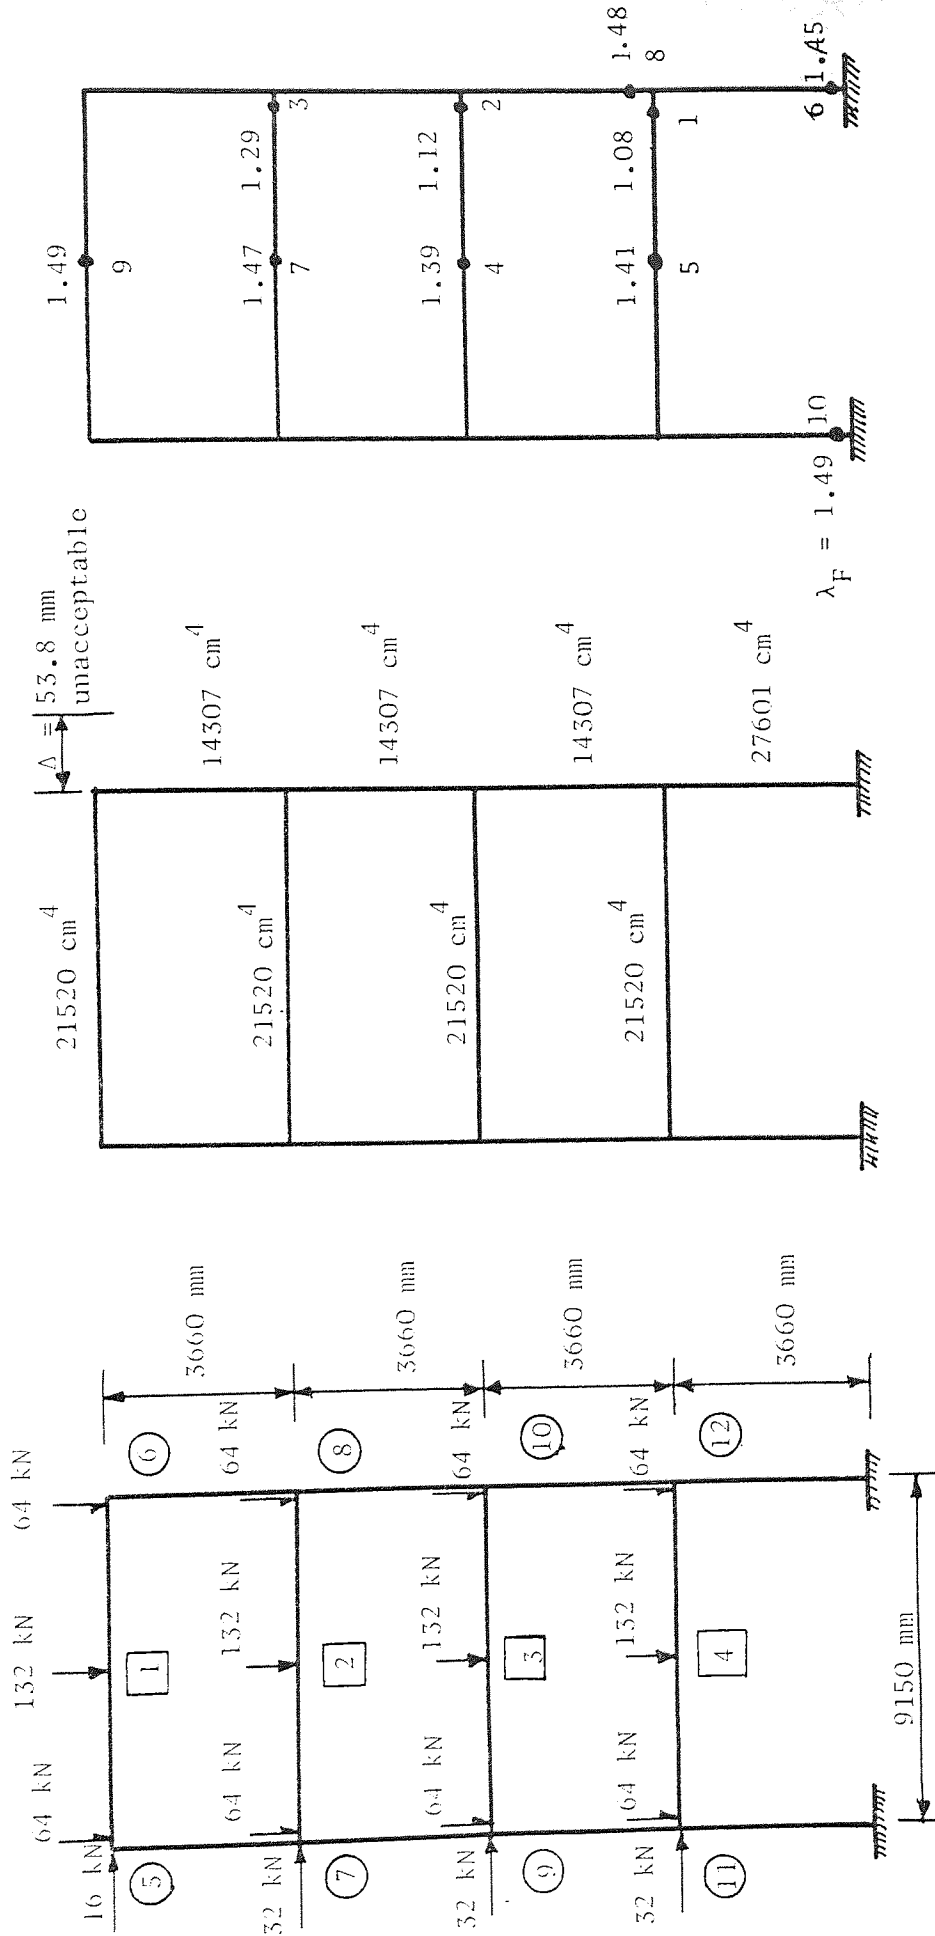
THE 4 STOREY SINGLE BAY FRAME
